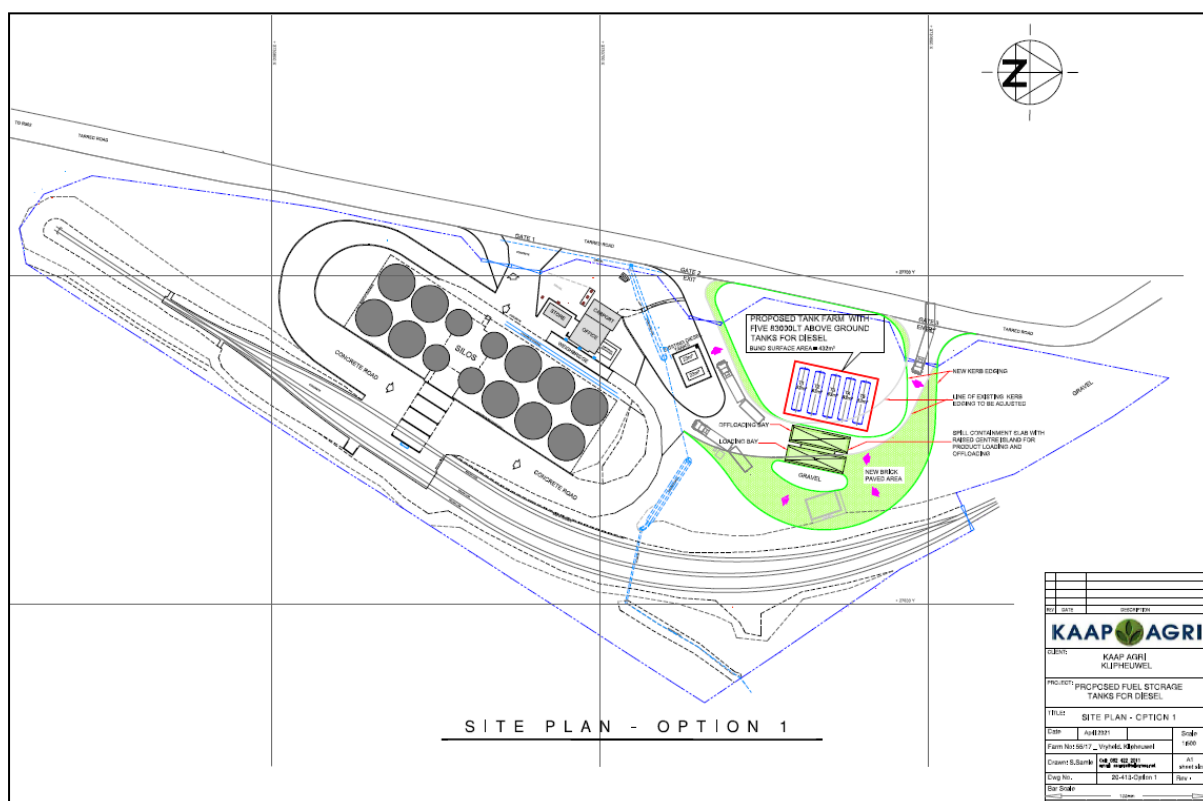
Site plan showing location of proposed additional fuel tanks
